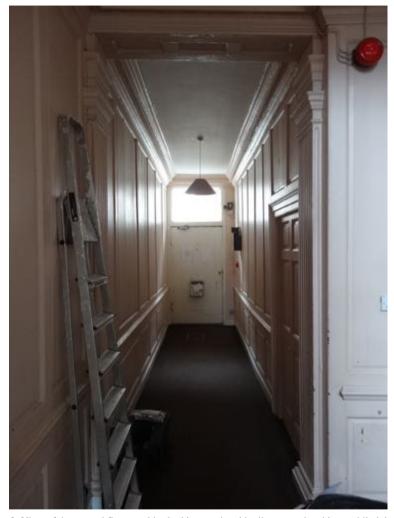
View of the ground floor corridor looking south, with pilasters and architrave, blind door on west wall and front door at the south end, March 2017.
